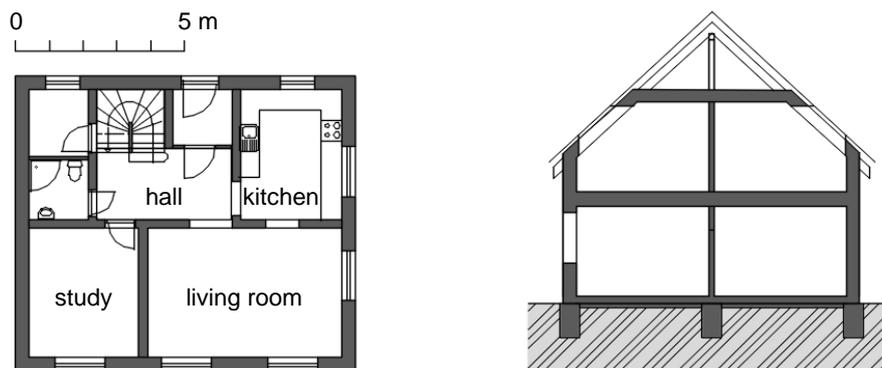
The studied single-family house. Left - first floor plan. Right - cross section.
